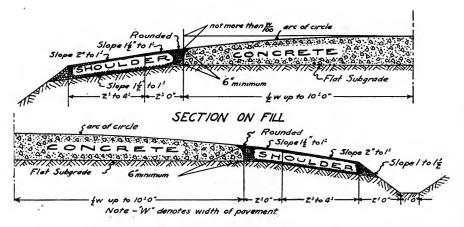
ONE-COURSE CONCRETE HIGHWAY. SECTIONS ON FILL AND CUT.
